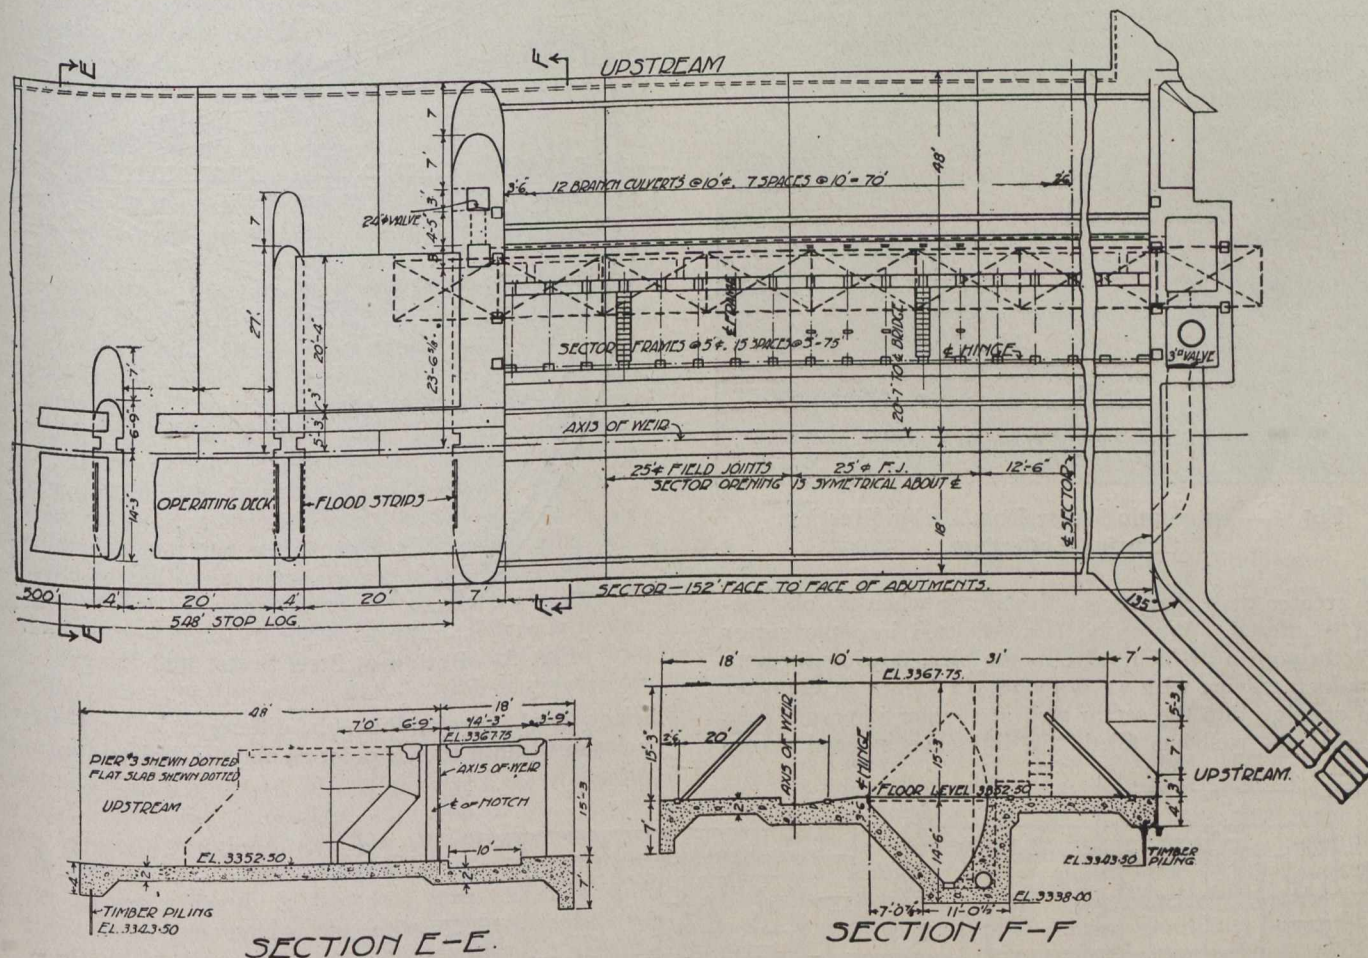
Layout Plan and Sections of Hydraulically Operated Sector Intake Weir.
